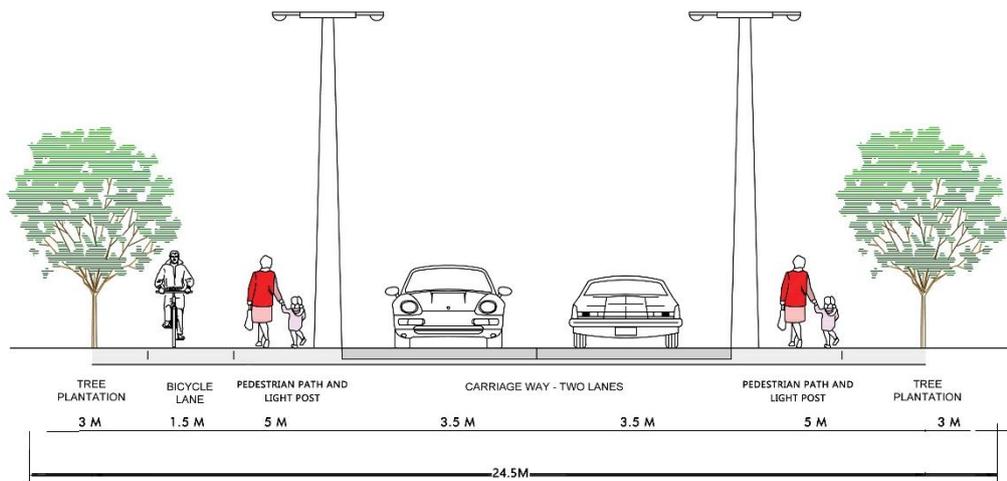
How the Kegalle-Rambukkana road should be developed
